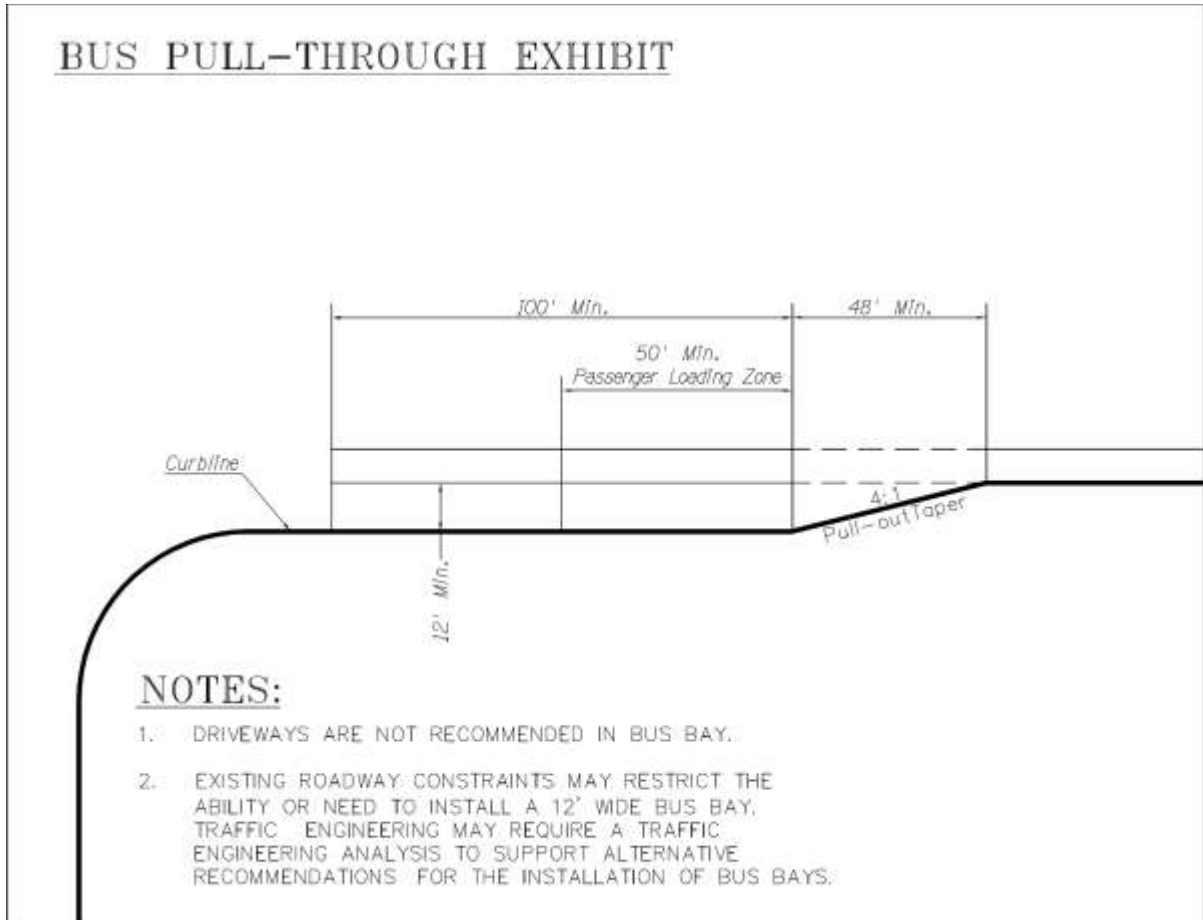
Bus Bay Detail 2 – Minor Intersections
